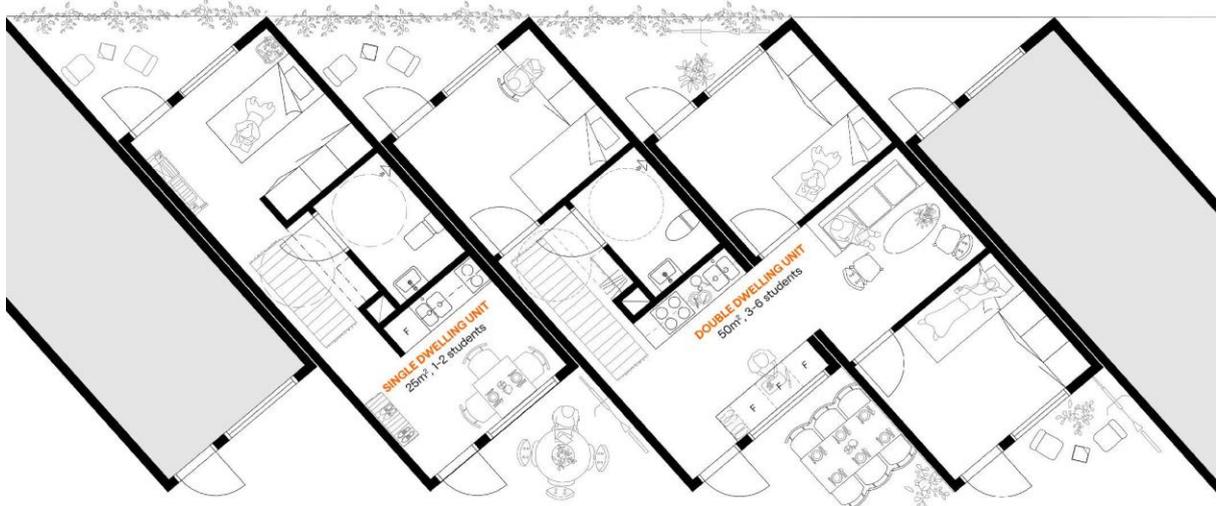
Ndarugu Apartment Floor Plan (Arkemi, 2019)
